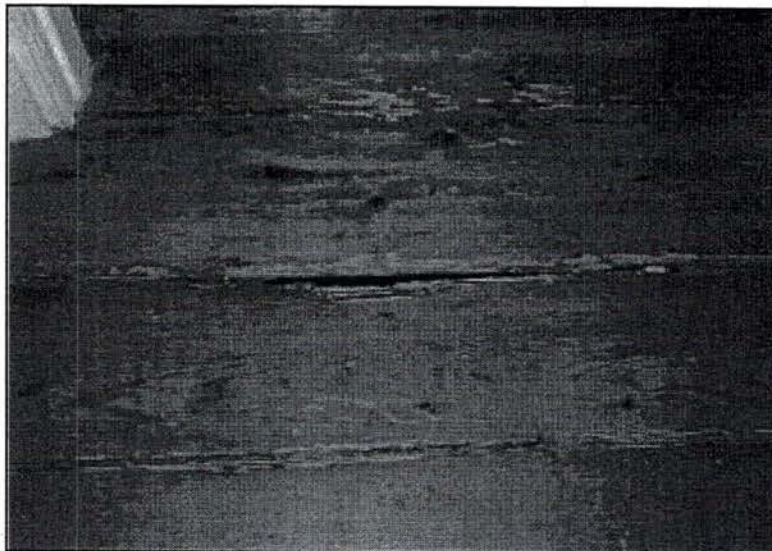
Damaged floors in Room 104 near the entrance to Room 102. This damage is typical of the wood floors.
